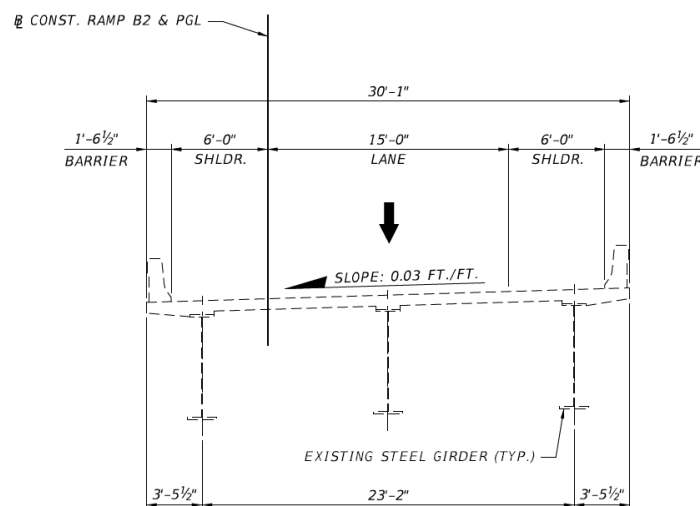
SR 429 Over West Orange Lake Boulevard Existing Typical Section (Bridge Nos. 750616 and 750617)
